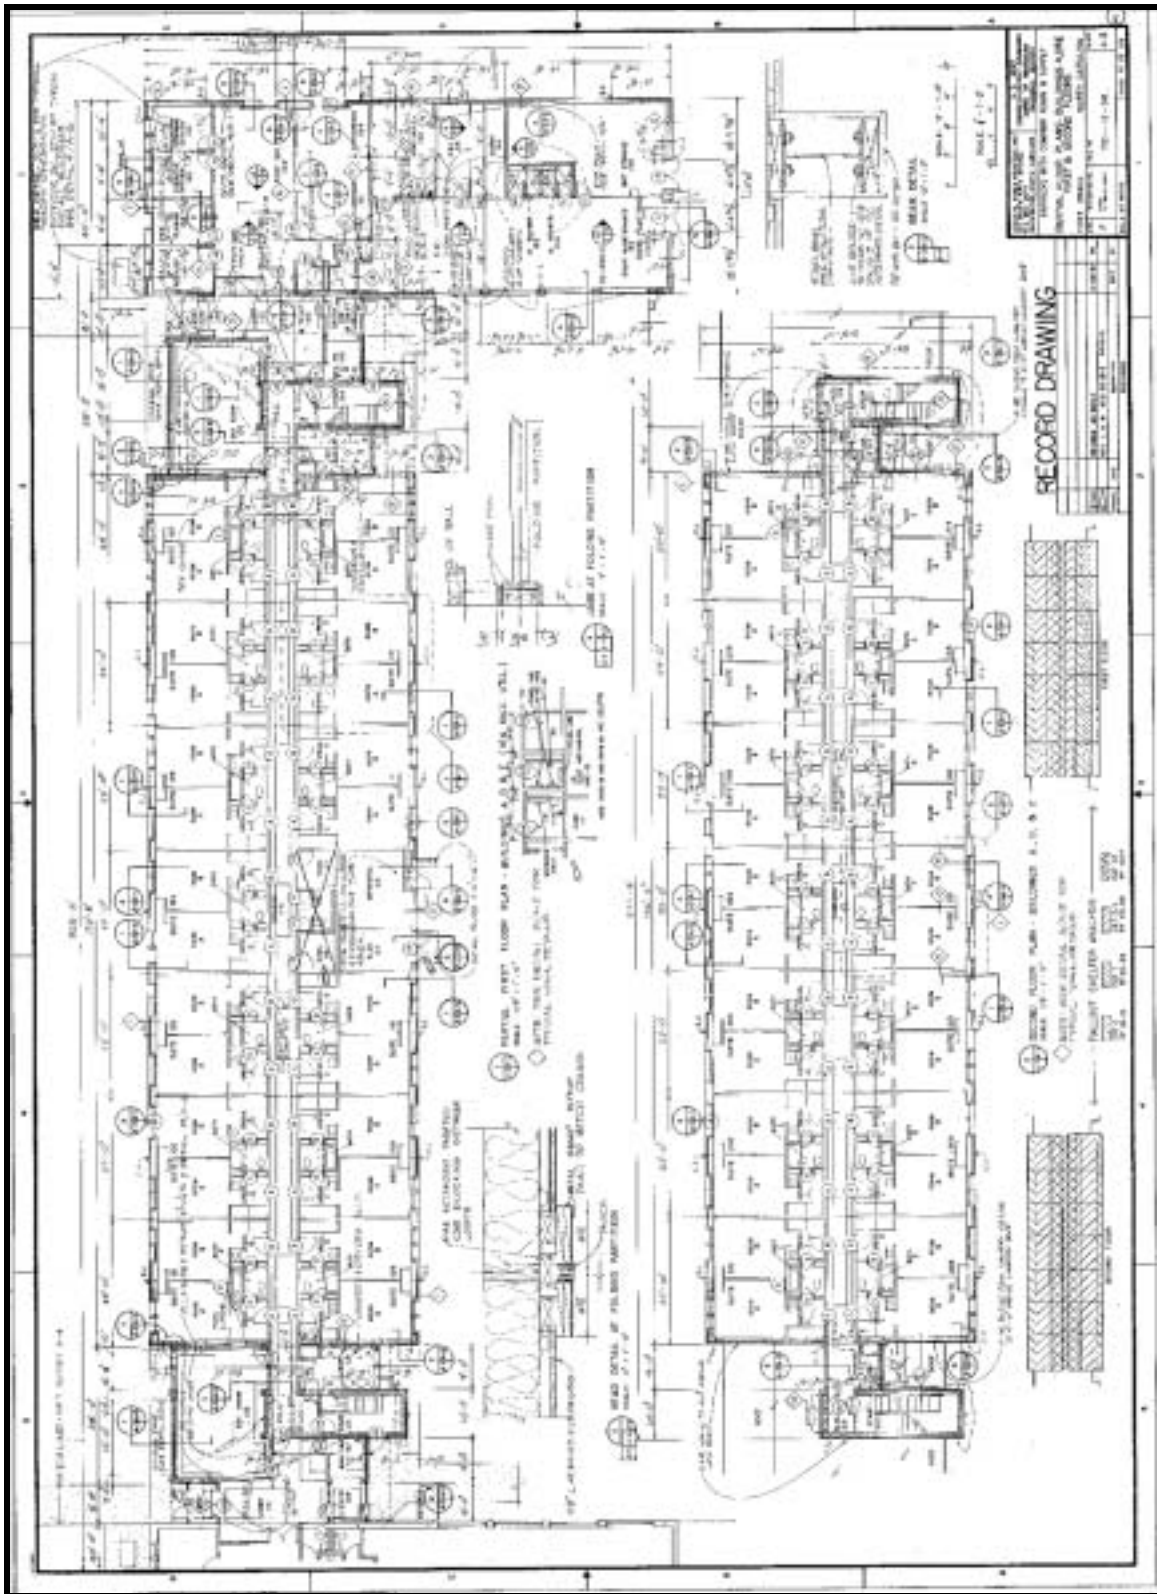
Quadrangle barracks, partial floor plans, first and second floors, Ft. Bragg (1985, revised 1987) (Engineering, Ft. Bragg).
